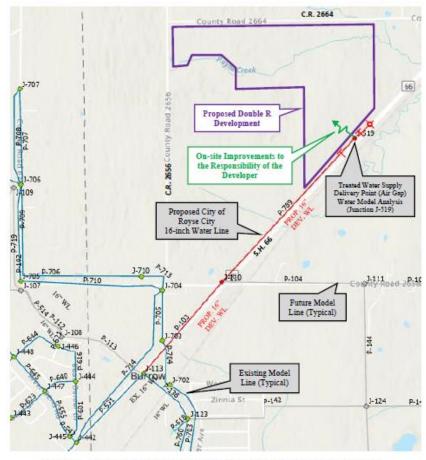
Proposed Development Location and Water Model Loading Junctions
